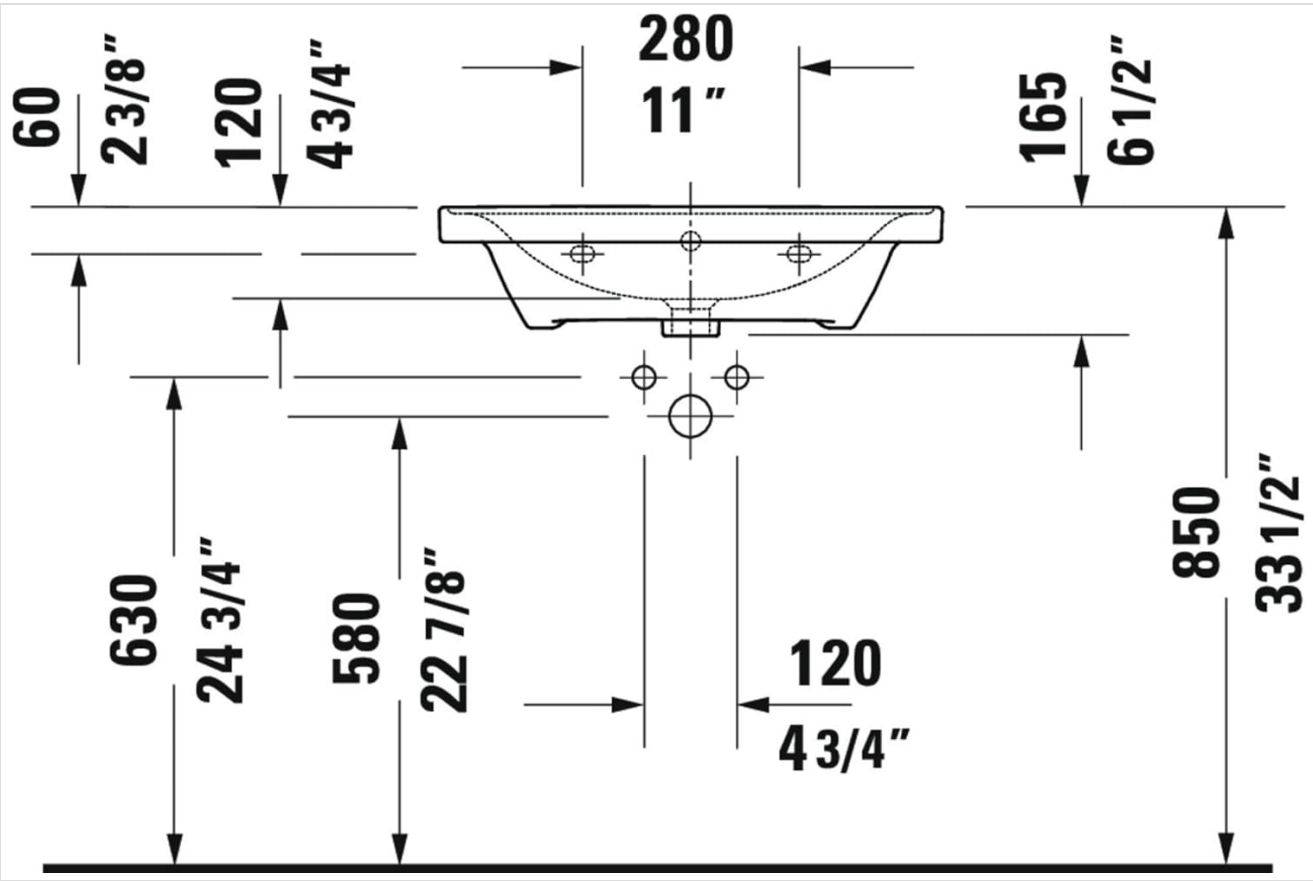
Side View Technical Drawing. This diagram shows the side profile dimensions of the sink, including height (165mm / 6 1/2") and recommended installation heights for plumbing connections. All measurements are in millimeters and inches.
